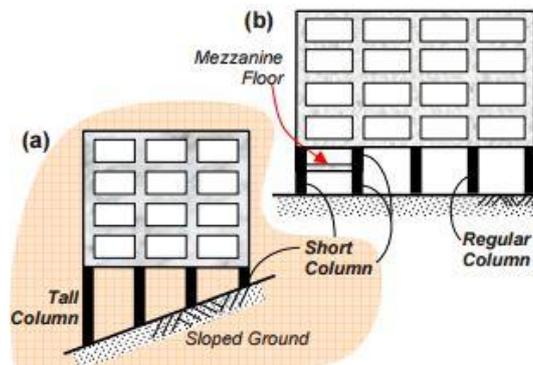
Buildings with short columns – two explicit examples of common occurrences.
